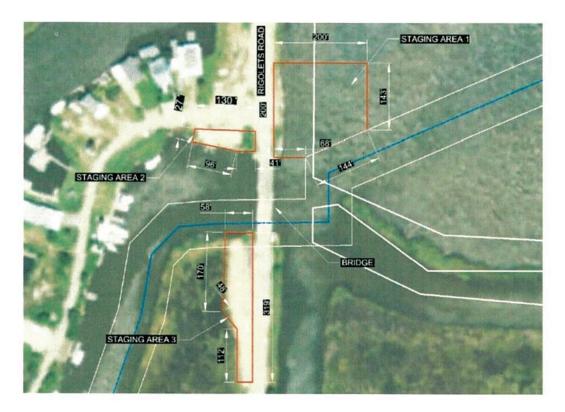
Staging Areas on Salt Bayou Road and Rigoletts/Highway 433
